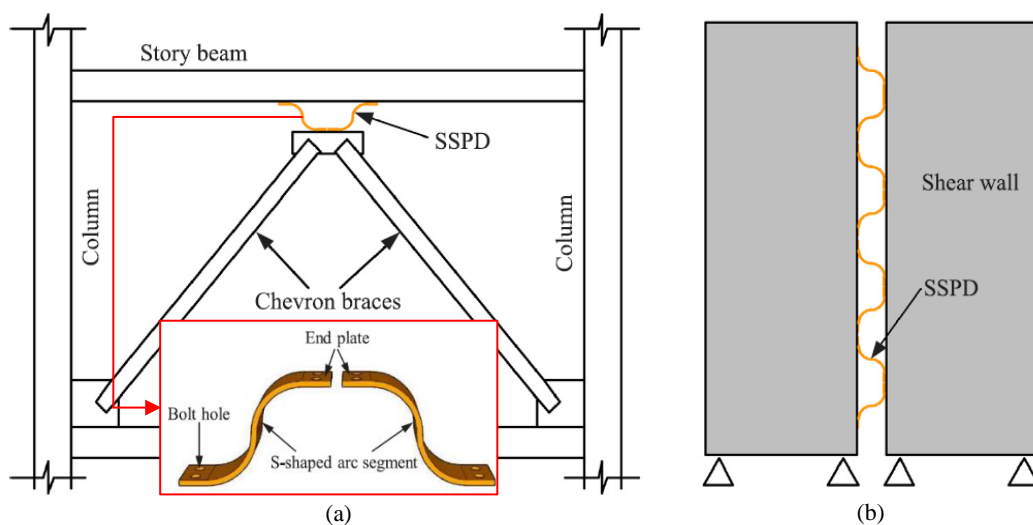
The potential applications of SSPD [160]: (a) Chevron braced frame equipped with SSPD; (b) Rocking wall system
